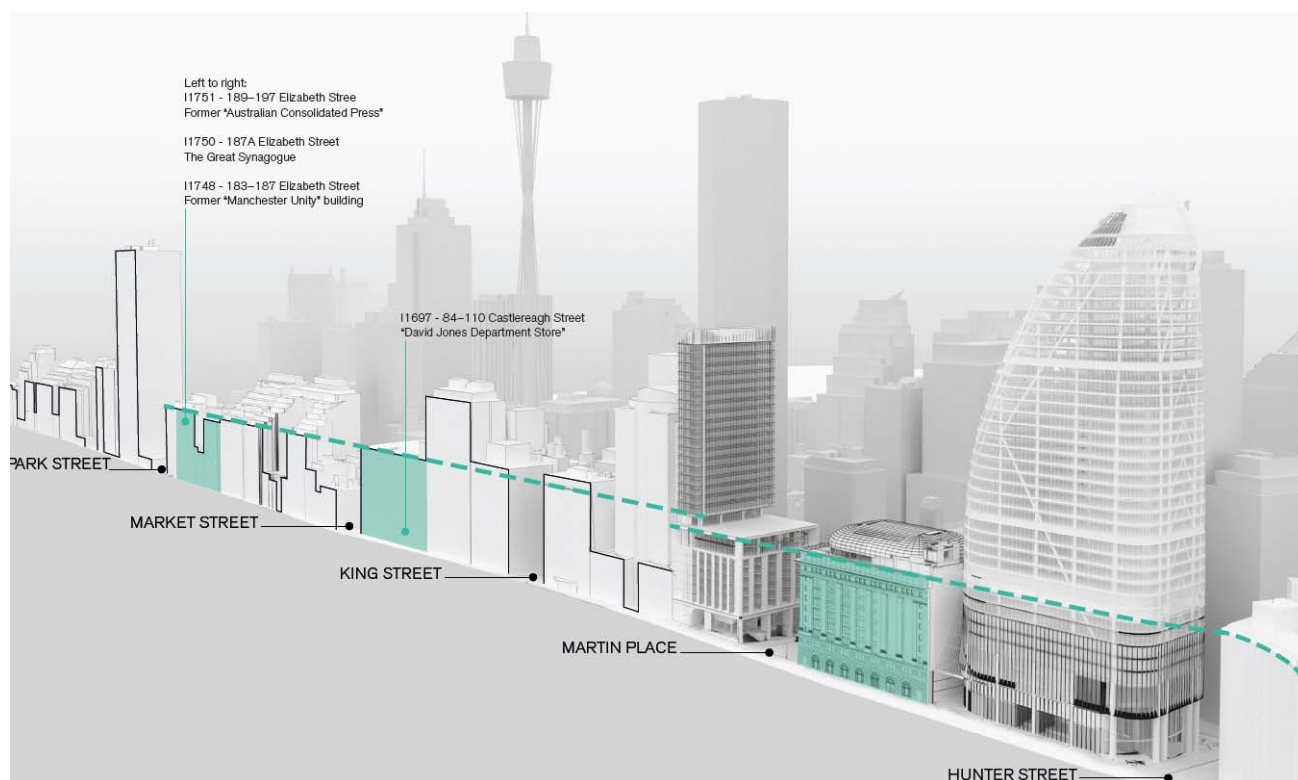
Potential for a continuous street wall, as viewed from Elizabeth Street
